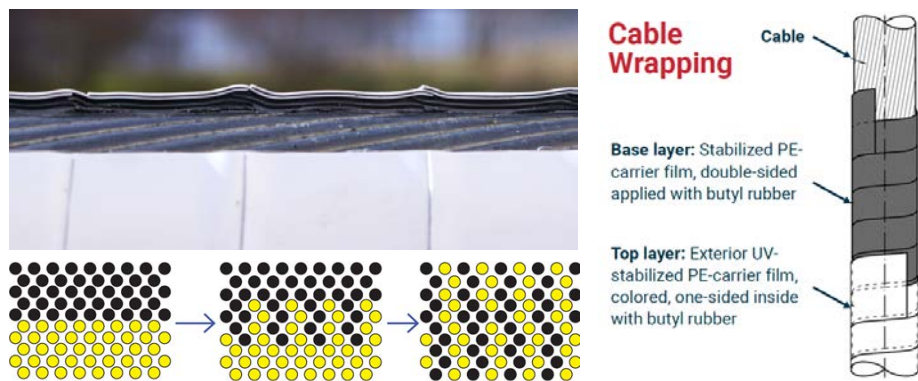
Butyl rubber tape system ATIS Cableskin<sup>®</sup>. Top left: Cross-section of the tape system wrapped around a spiral cable. Tape section cut out for demonstration. Bottom left: Schematic view of the interdiffusion process (cold welding) of the butyl rubber molecules between two single tape layers. Right: Schematic view of the helical wrapping of the base layer and the top layer – each with 50 % overlap.
